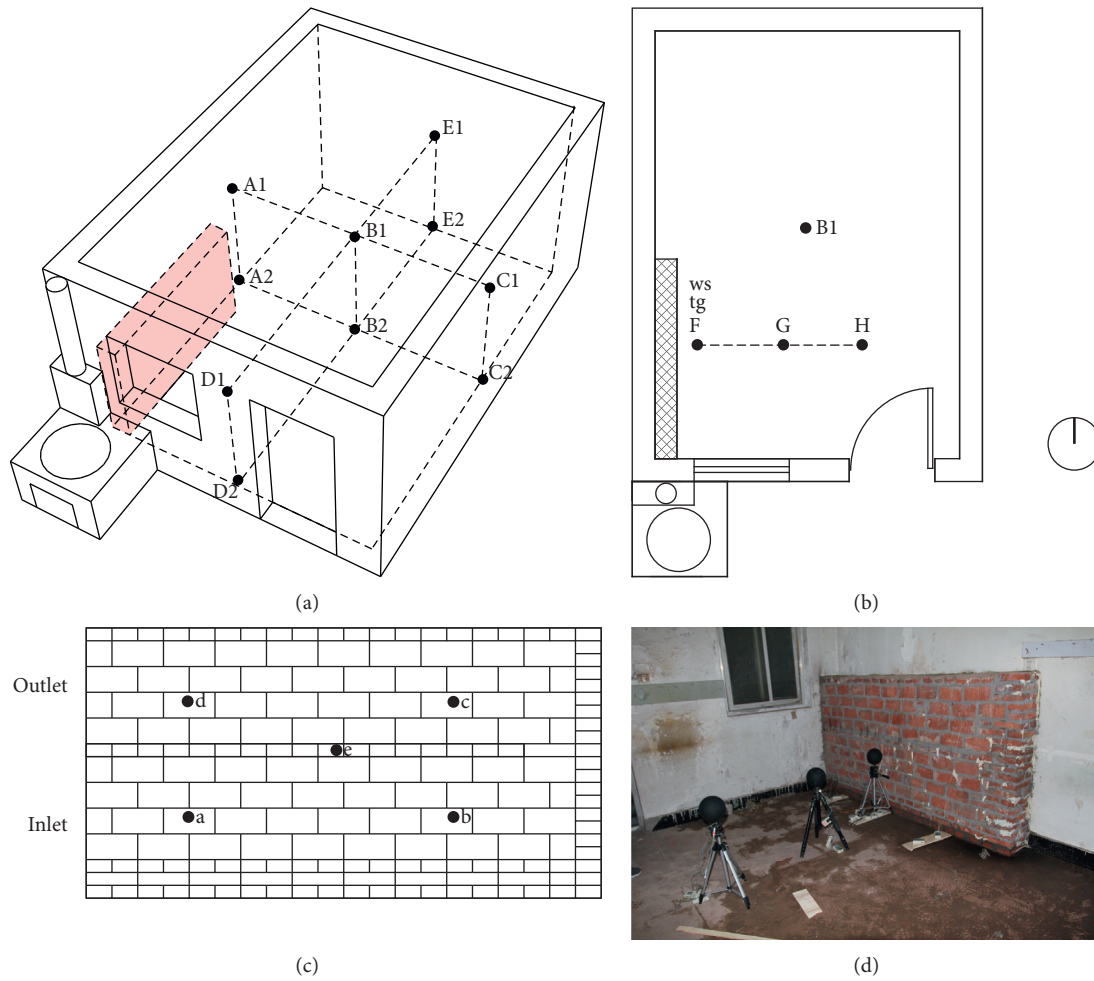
Layout of the test room and testing point arrangement: (a) axonometric view, (b) plan view, and (c, d) heated wall.
